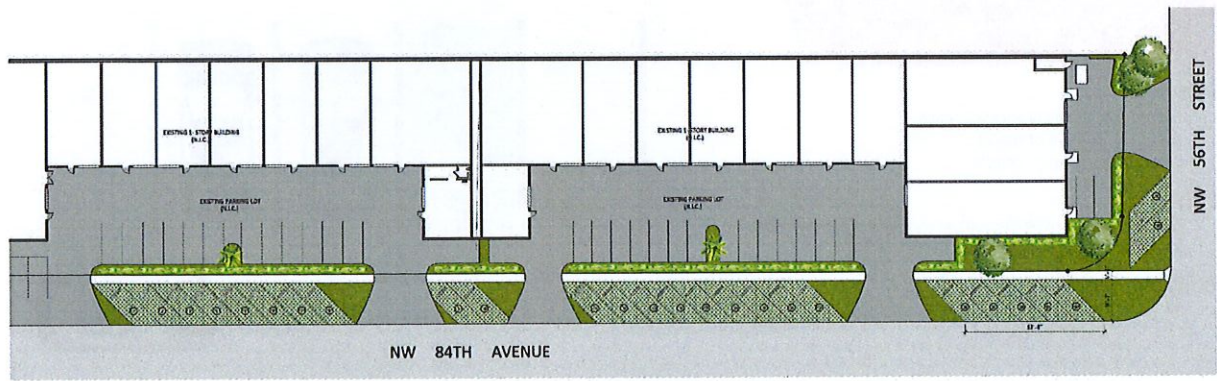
Proposed Parking Concept for 84th Avenue. Source: DNB Design Group.
